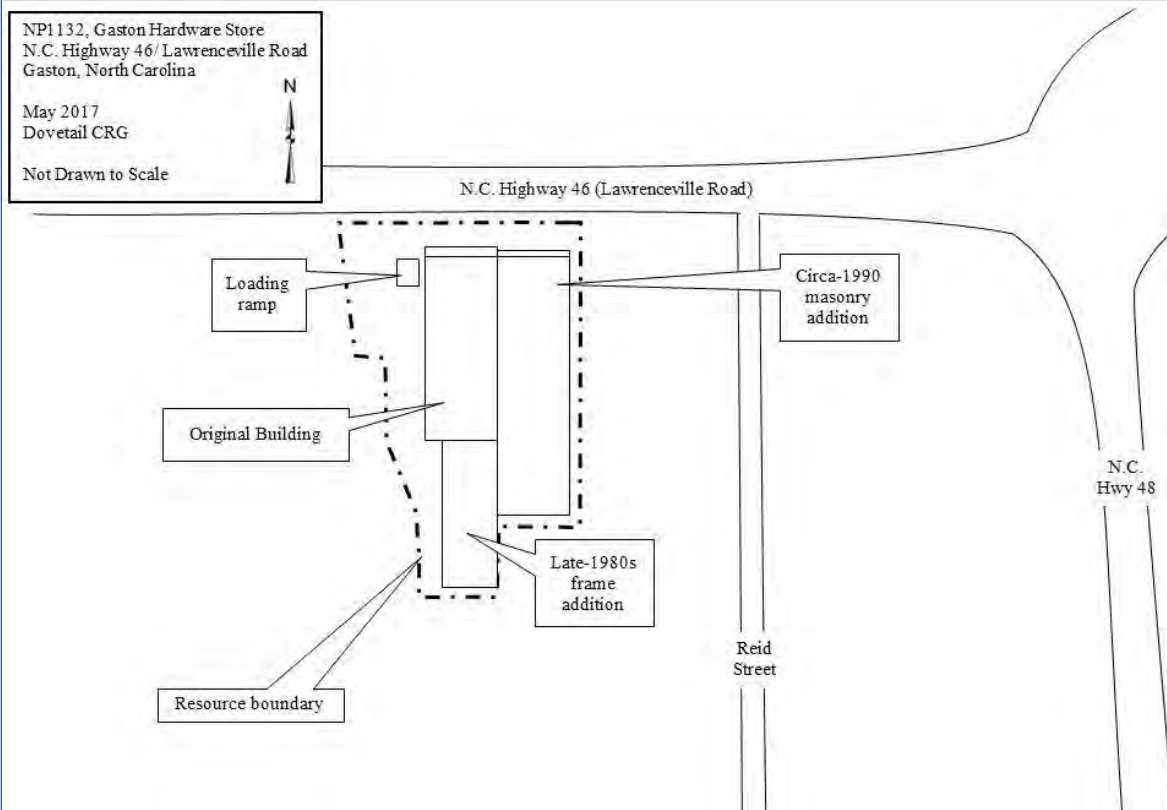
Gaston Hardware Store (NP1132) Site Plan.
